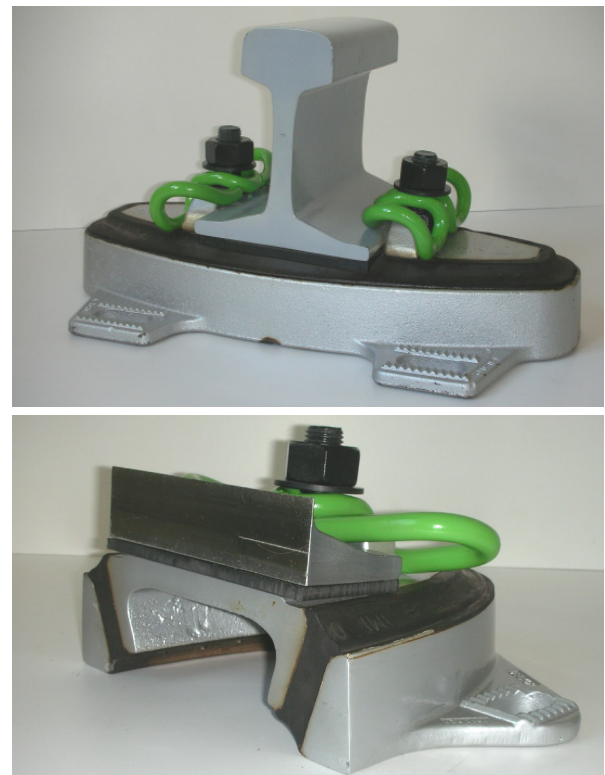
Recent elastic rail fastening system “Delcor Egg” of the company Vossloh to be improved for railway bridges within the project ‘LZarG’ (above: total view, below: cross section).
